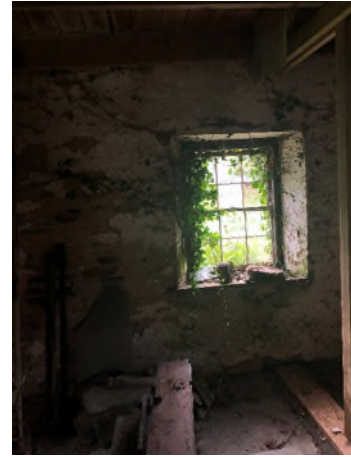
Internal image of window 10 in the south eastern facing wall.
